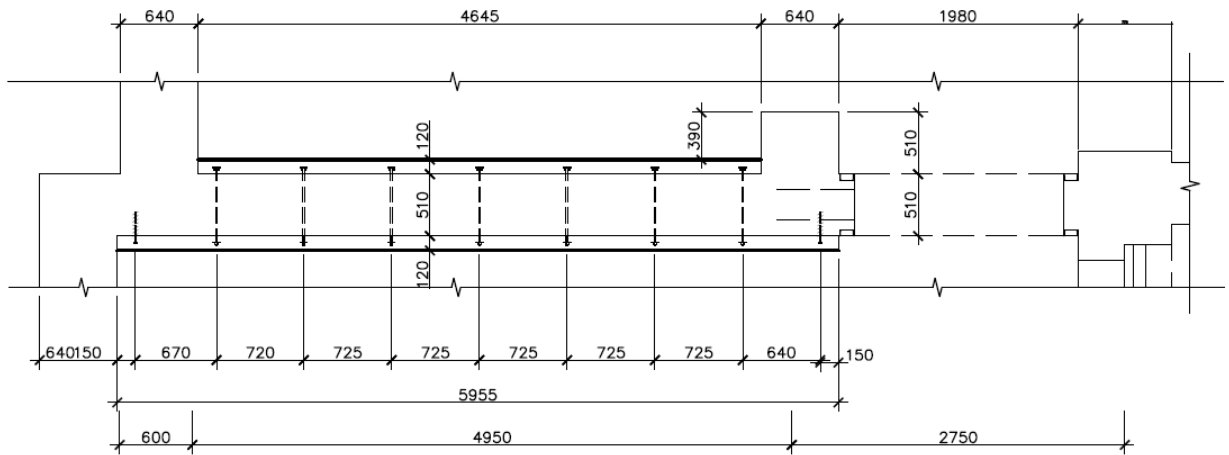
The scheme of arrangement of a reinforced concrete shell at the level of the first floor
